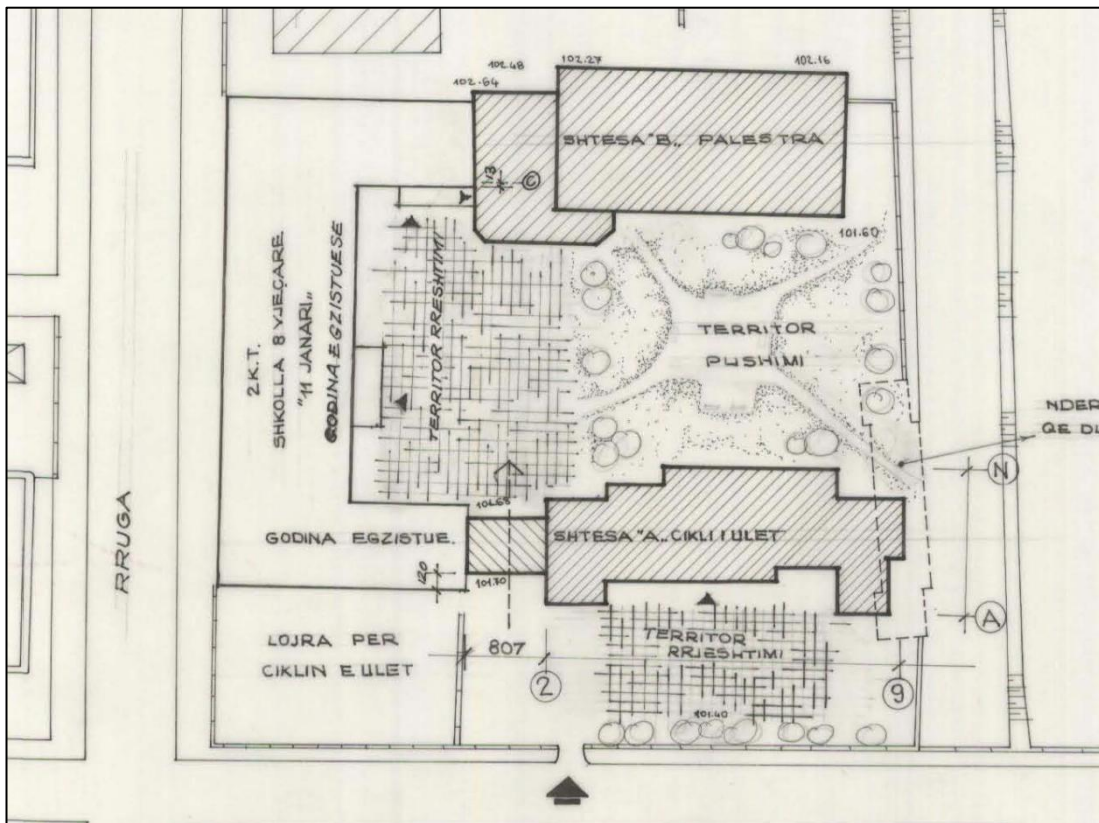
An adopted school building and the addition (State Technical Archive).
